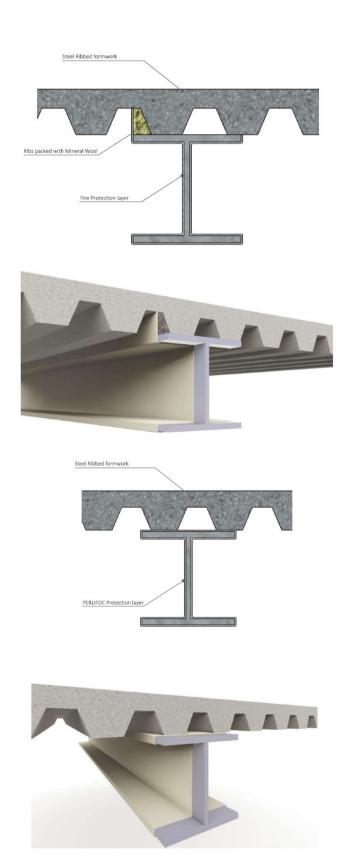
Nullifire SC901/902 protected steel beam interfacing with composite floor – Steel beam parallel to voids
